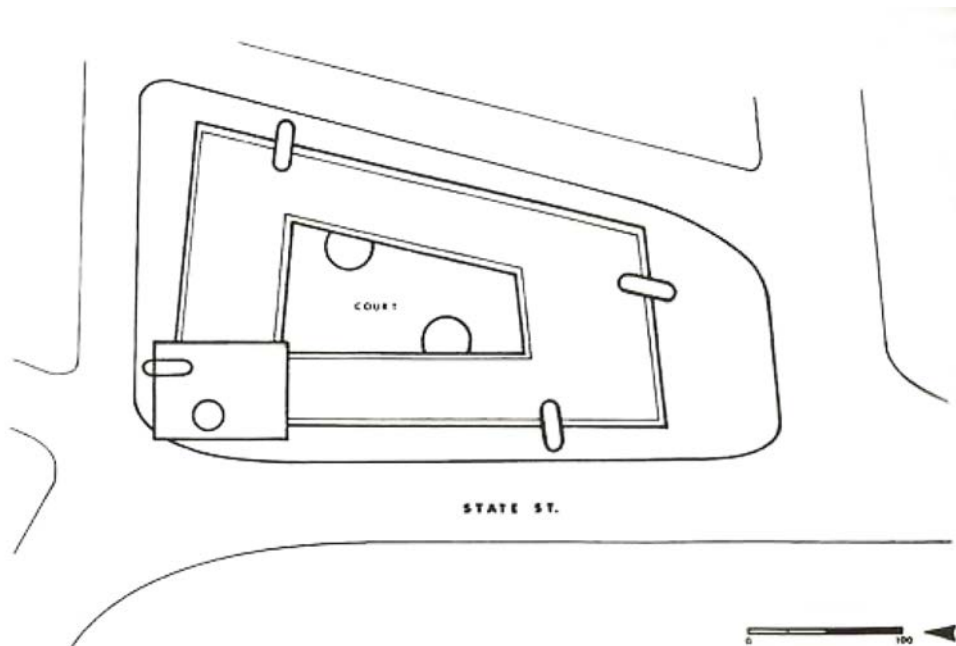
Site and roof plan of Community Services Building (Metz, 58).
